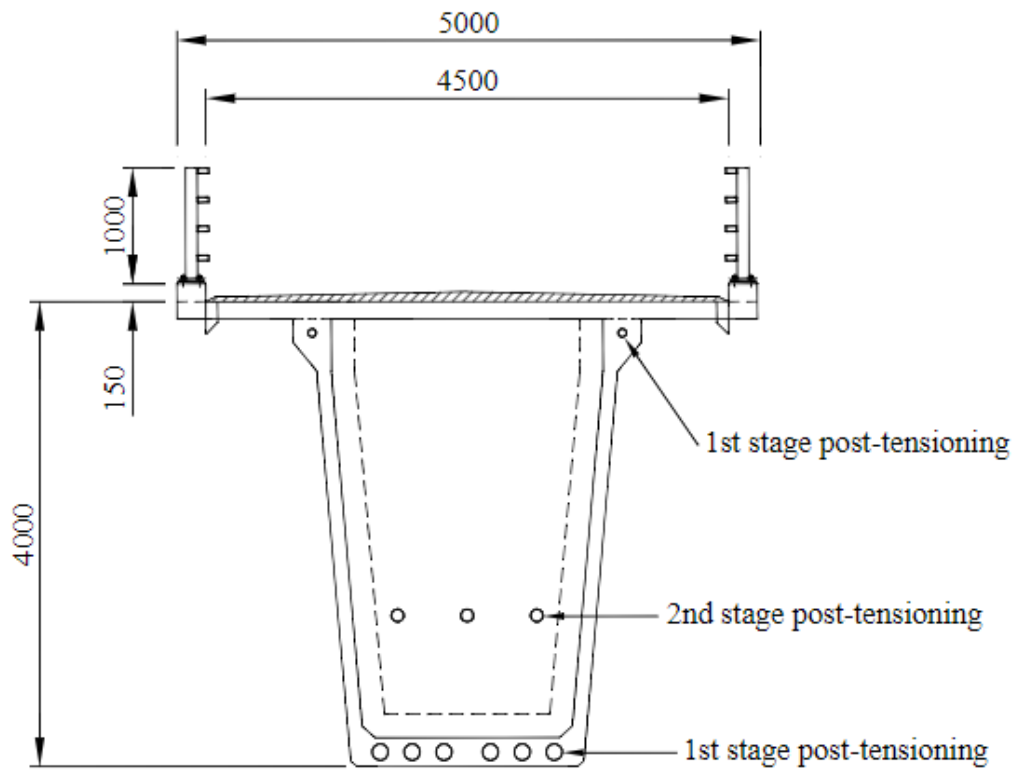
Jakway Park Bridge, Iowa (Graybeal 2009).
